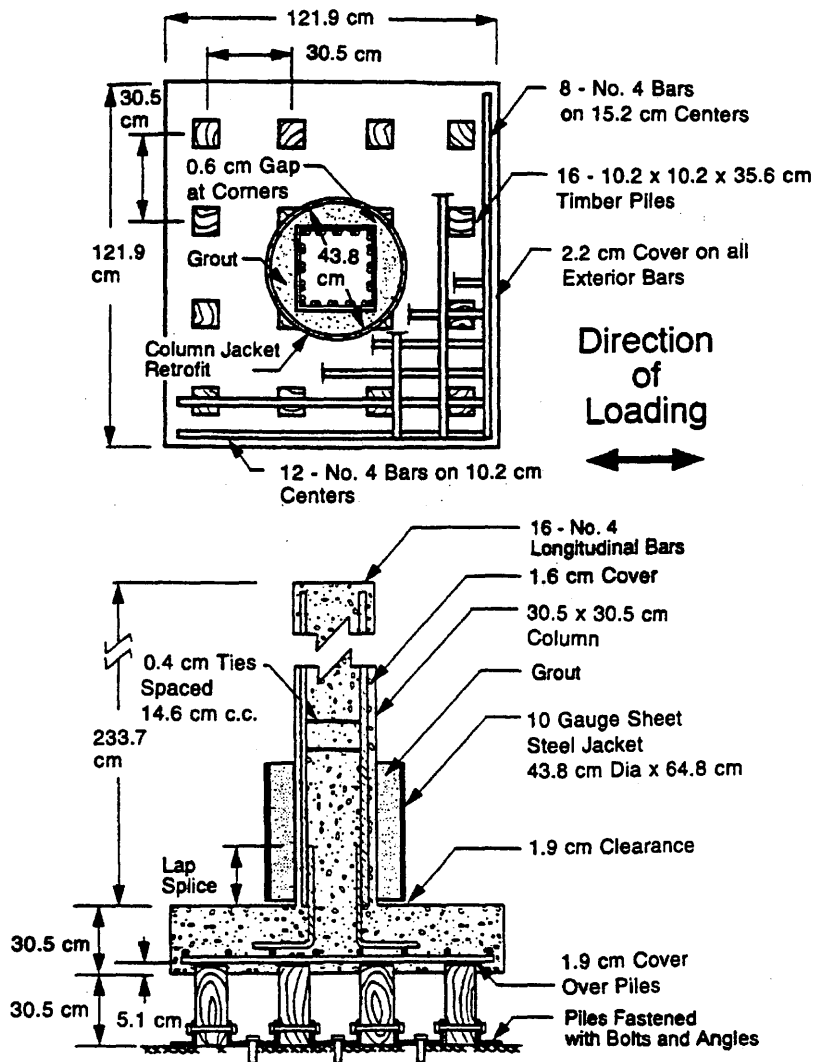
Details of specimen representing as-built conditions, Specimen No. 1 (1 in. = 2.5 cm).
